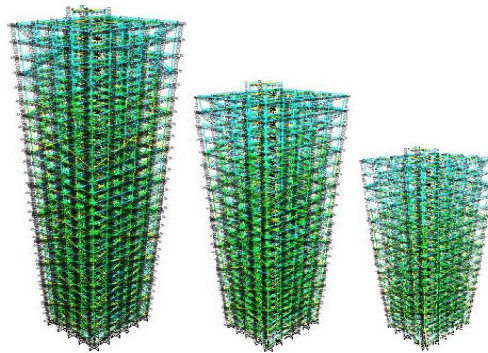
The 3 modeled tall buildings with braced tube frame system
